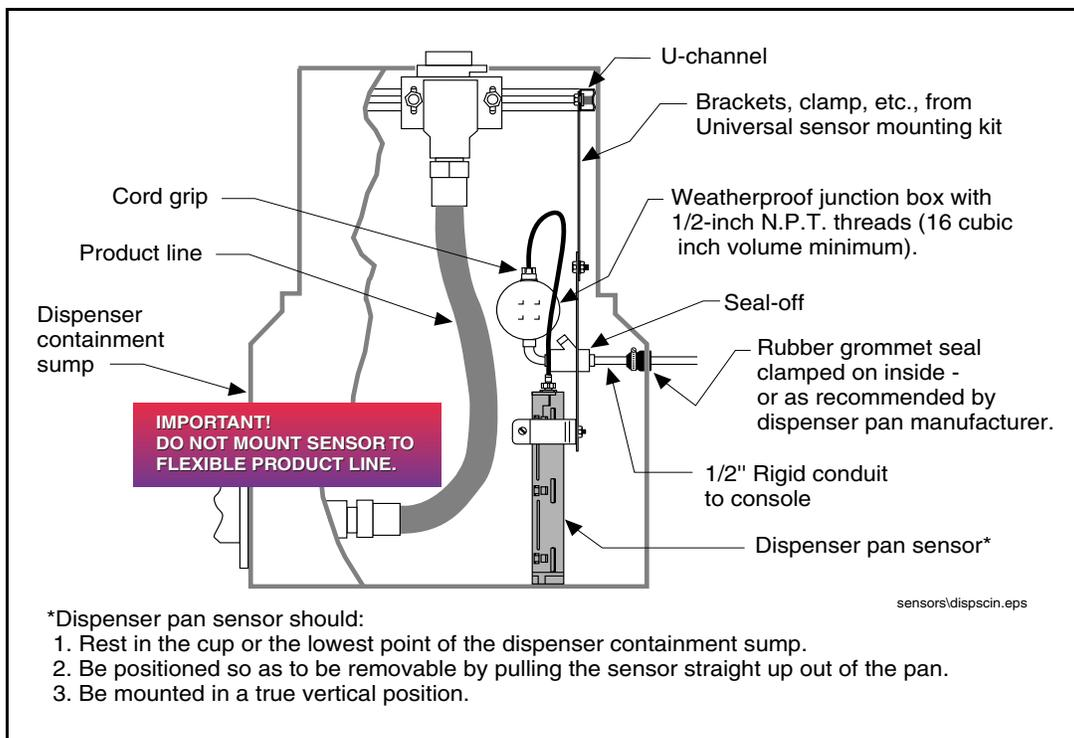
Typical Dispenser Pan Sensor Installation in a Dispenser Containment Sump
